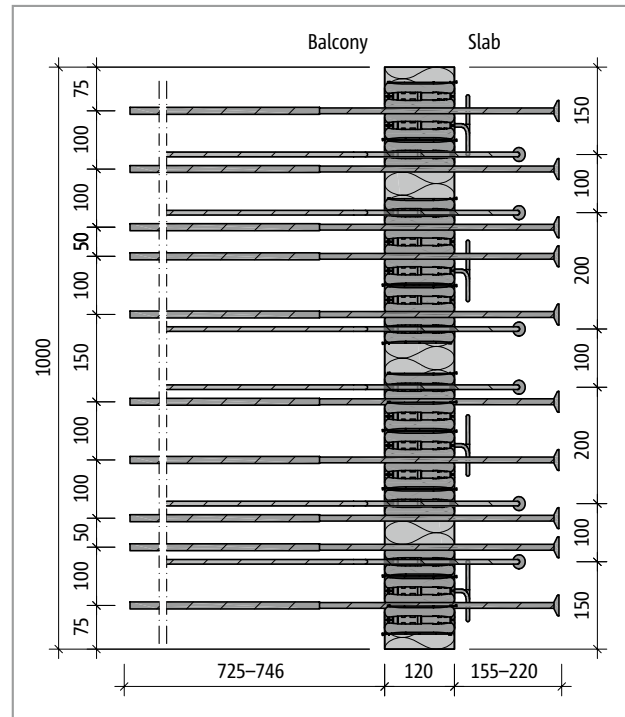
Schöck Isokorb® XT type K-U-M4: Product plan view
